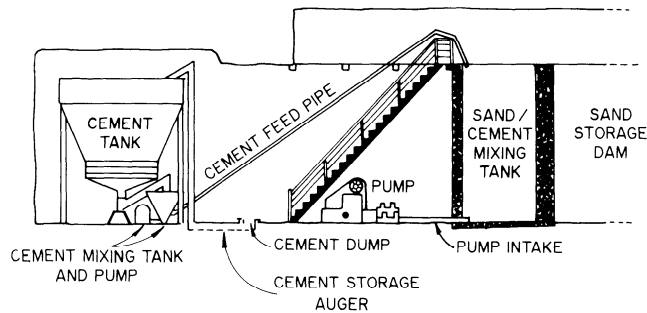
9700 sand plant. Bulldog Mountain mine (Simonson and Logsdon, 1983).
